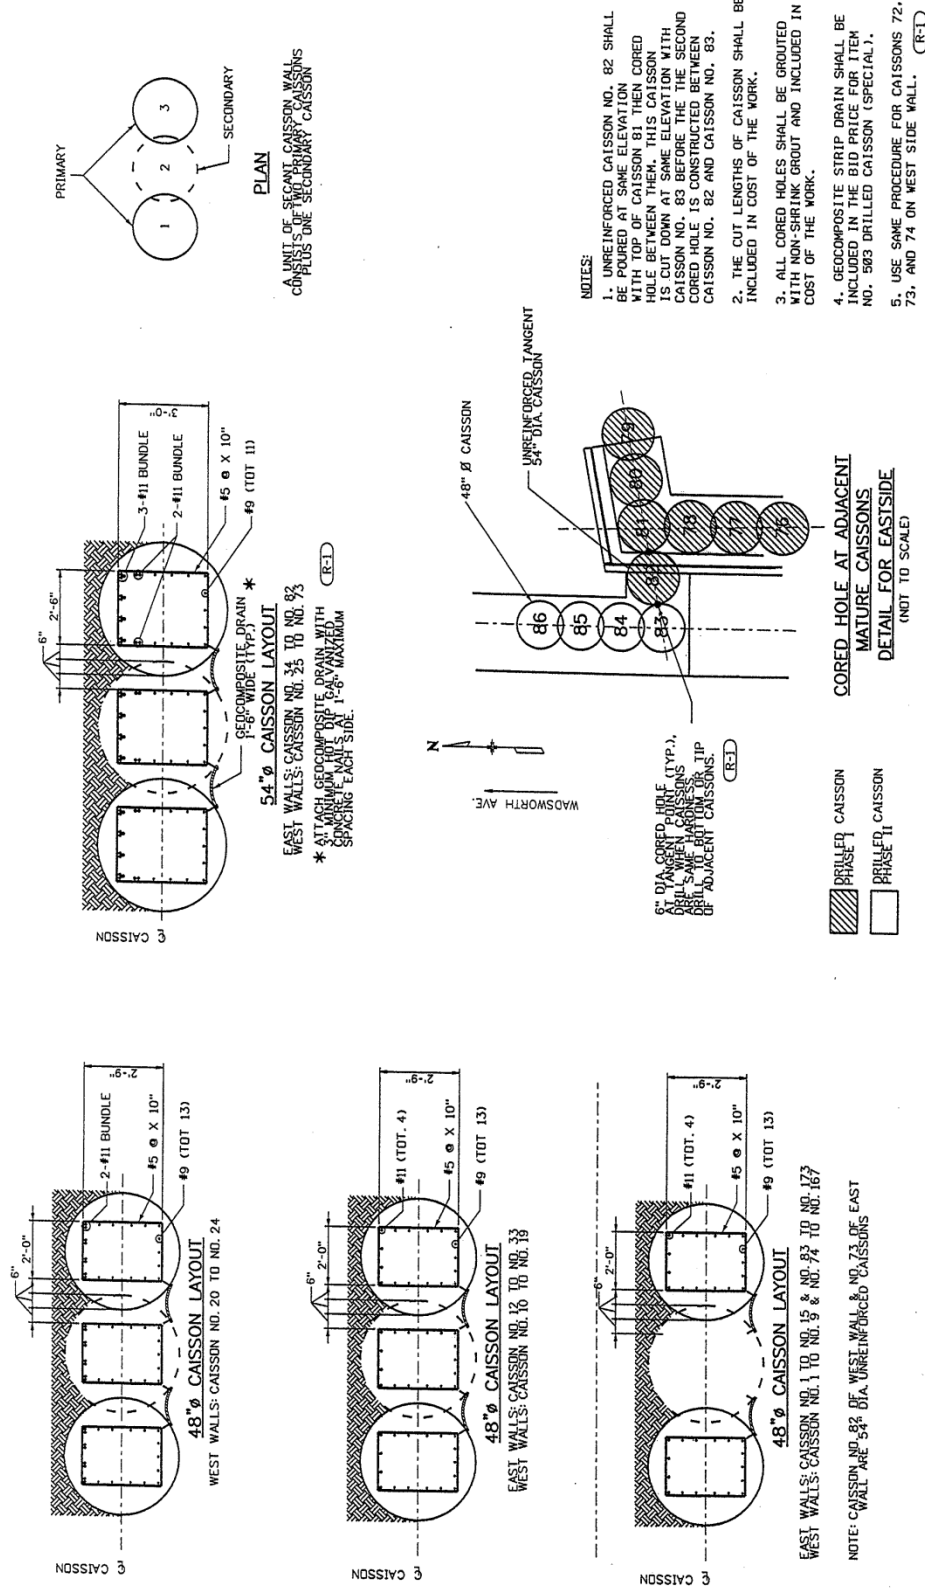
Secant Caisson Wall Details Example
